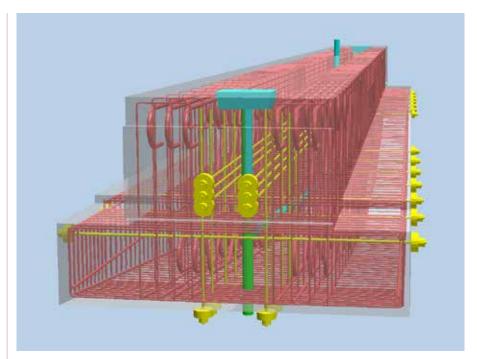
Image of crosshead showing existing and strengthening reinforcement
